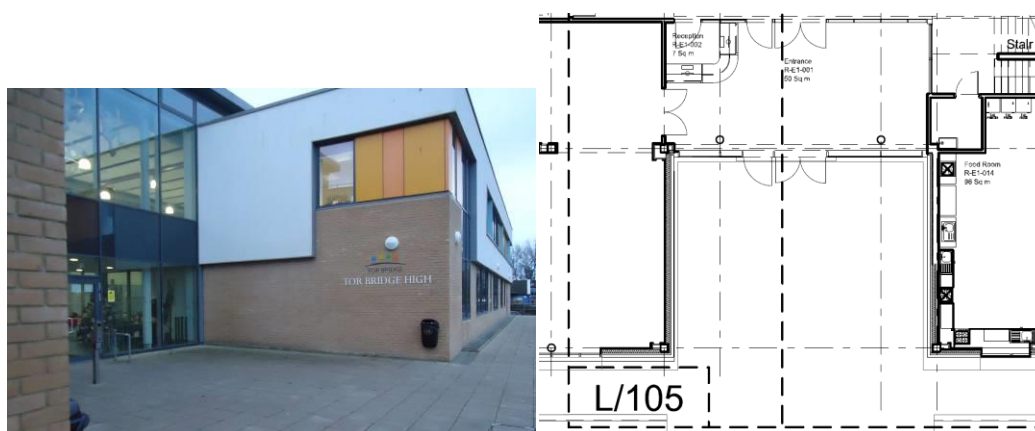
North West facing entrance to school, U-shape can cause wind vortex to occur
